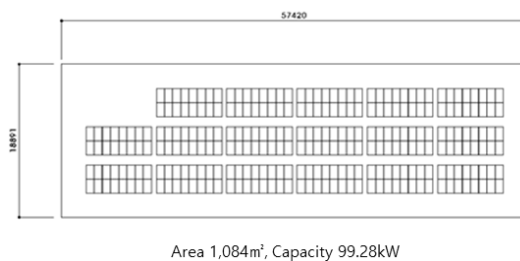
Floor plan of 100kW capacity site in Fig. 19
